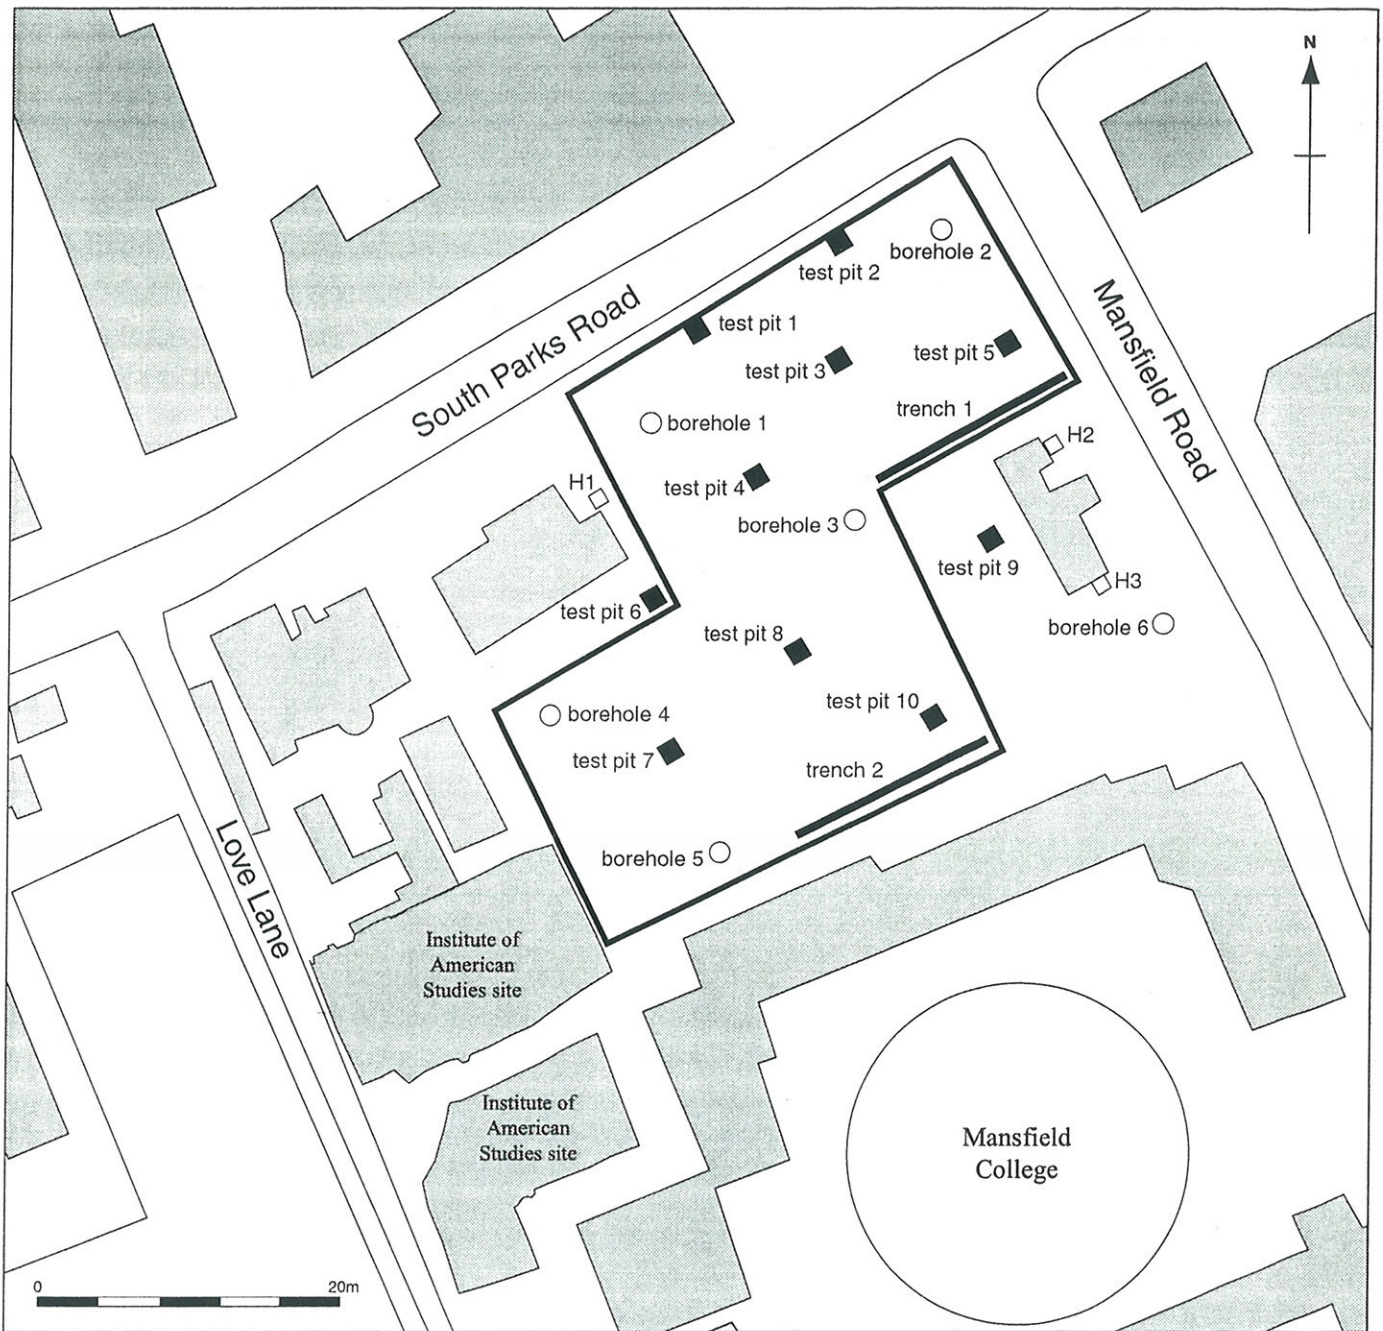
Plan of the site showing location of trenches and testpits from previous watching briefs
